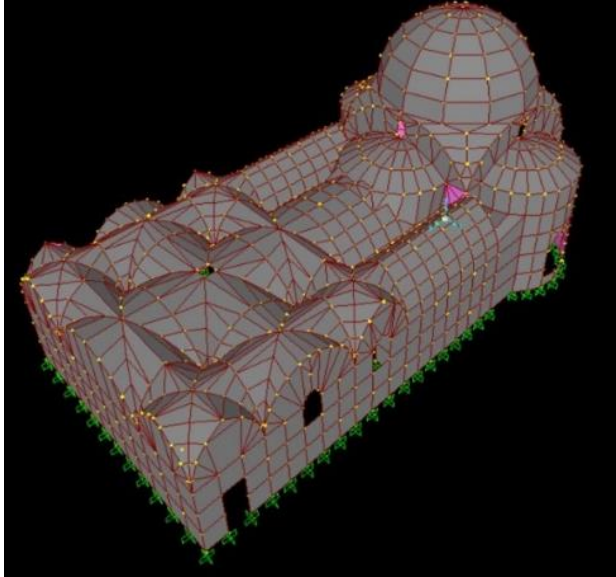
Surp Simon Church Finite Element Model 3D View (SAP 2000)
